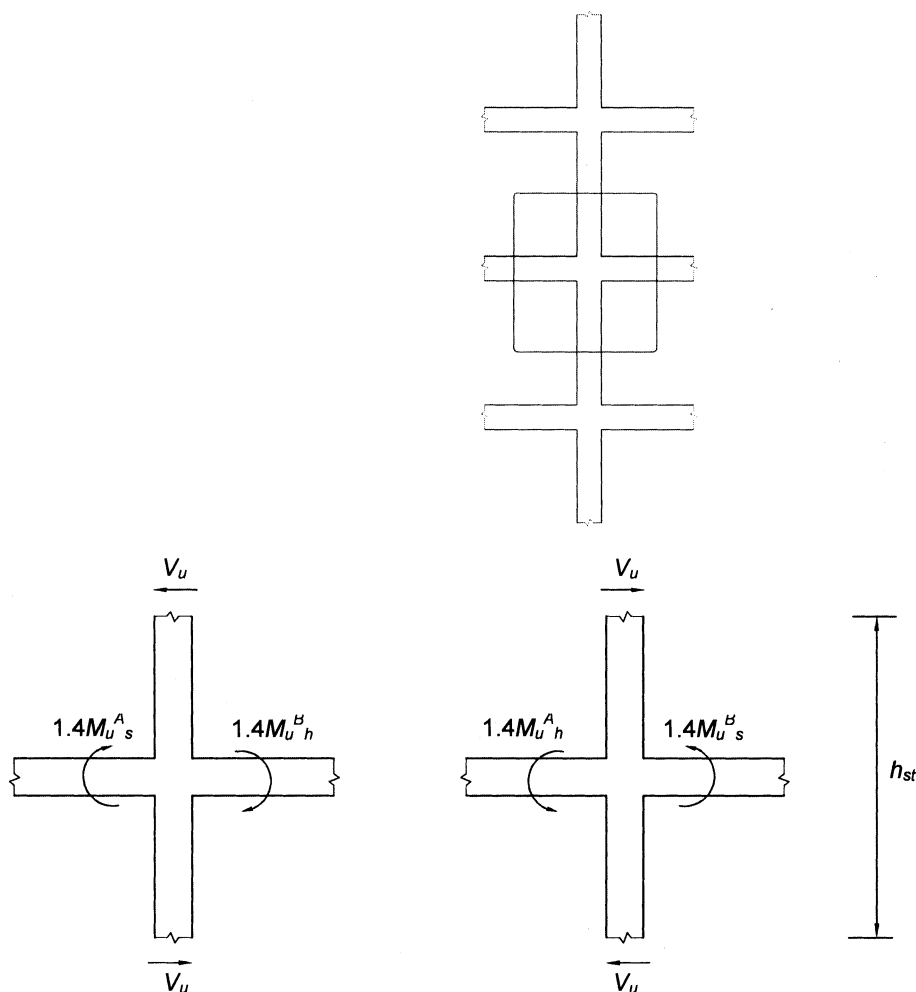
EQUILIBRIUM DESIGN SHEAR FORCE DEMAND ON COLUMN WHEN PLASTIC HINGES ARE FORMED AT BEAM ENDS
